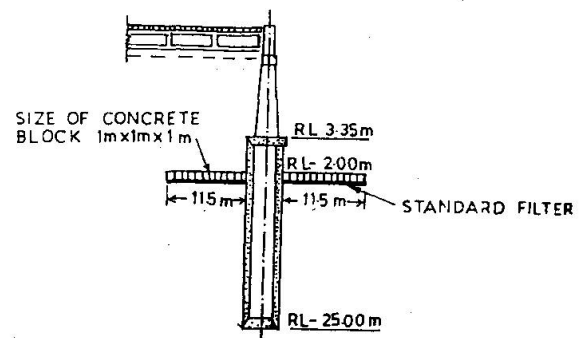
DETAILS OF PROTECTION AT ALAMURU BRIDGE PIER NO. 4
